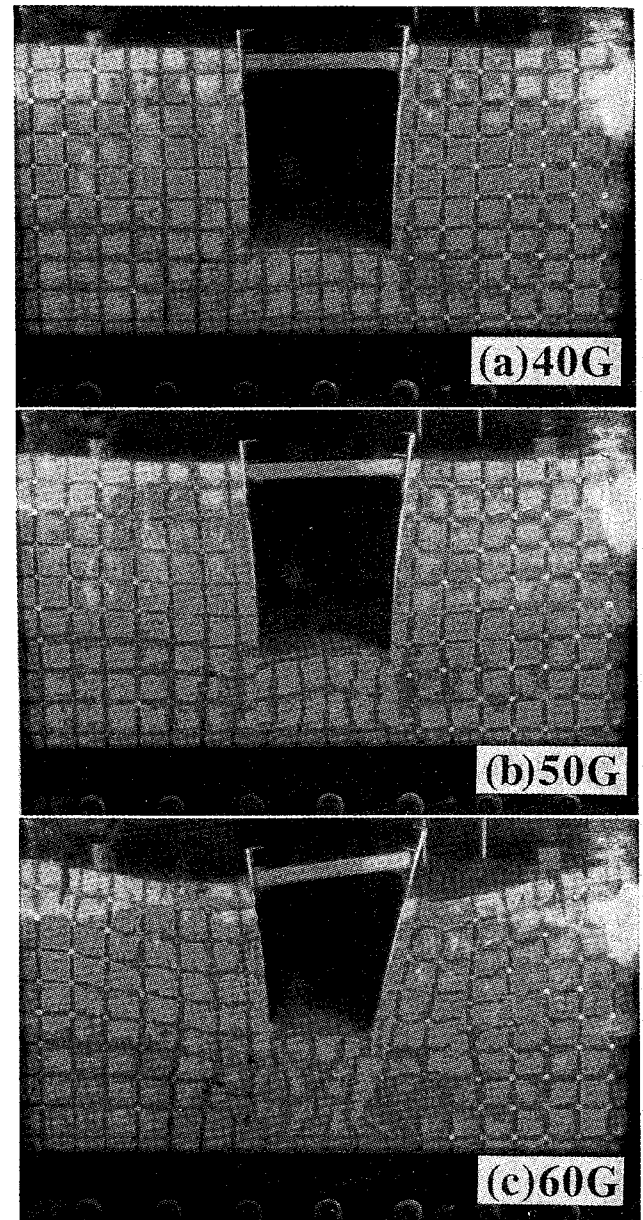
Sequence of failure in sheet pile wall. (Test D6)
